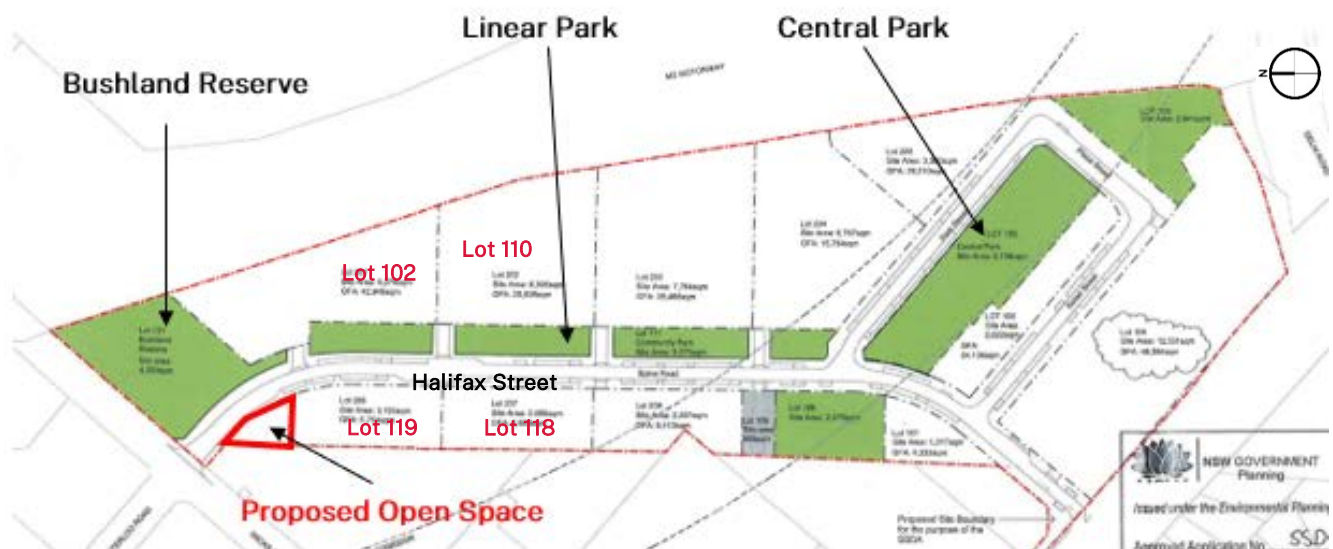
| Existing open spaces and the proposed open space (on Lot 119)
